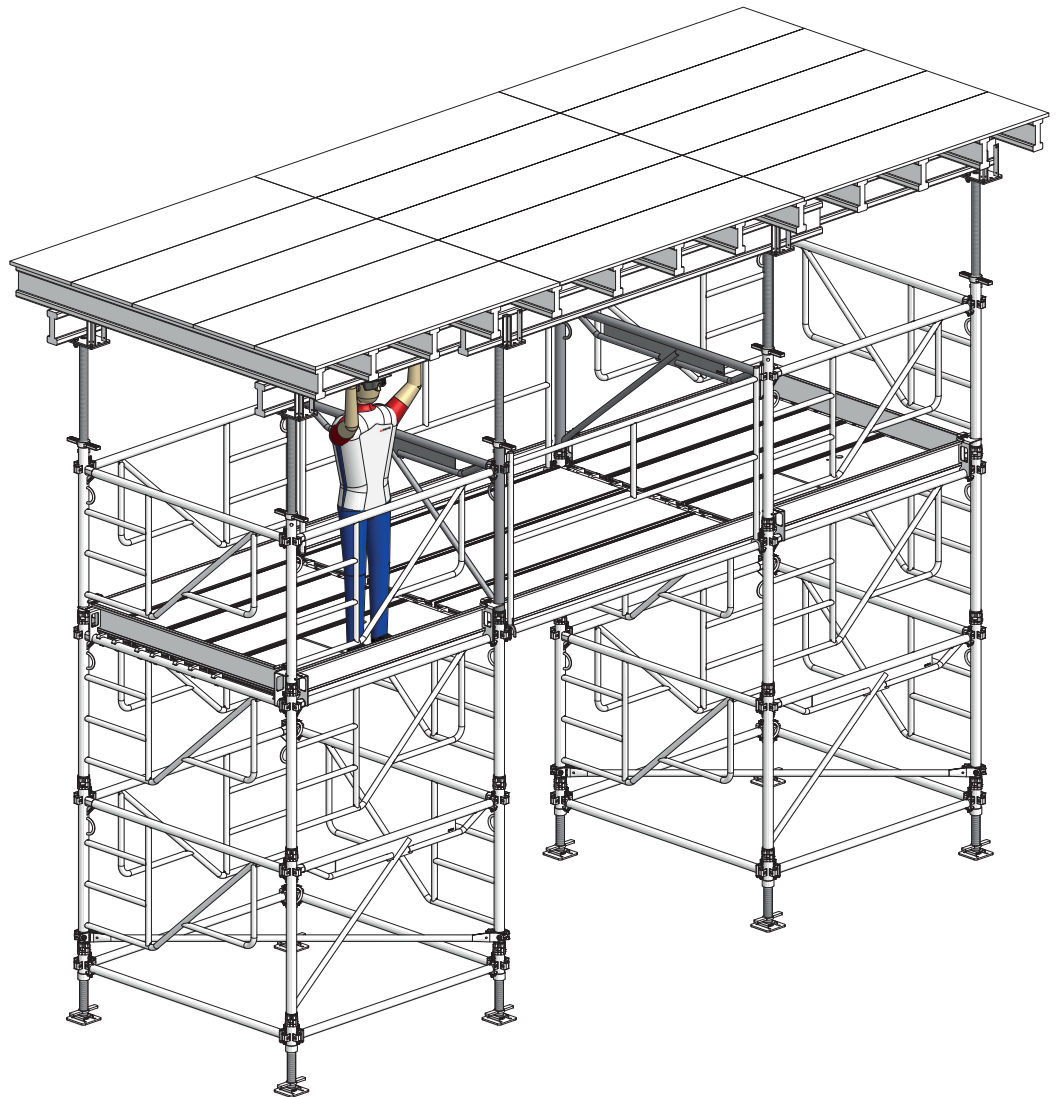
Shoring towers MT 60 supporting the MevaFlex slab formwork
